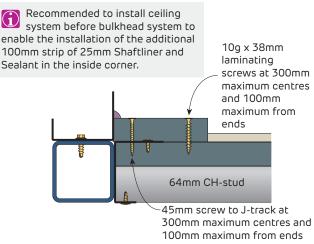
Construction of Shaft Wall L-shaped Duct
